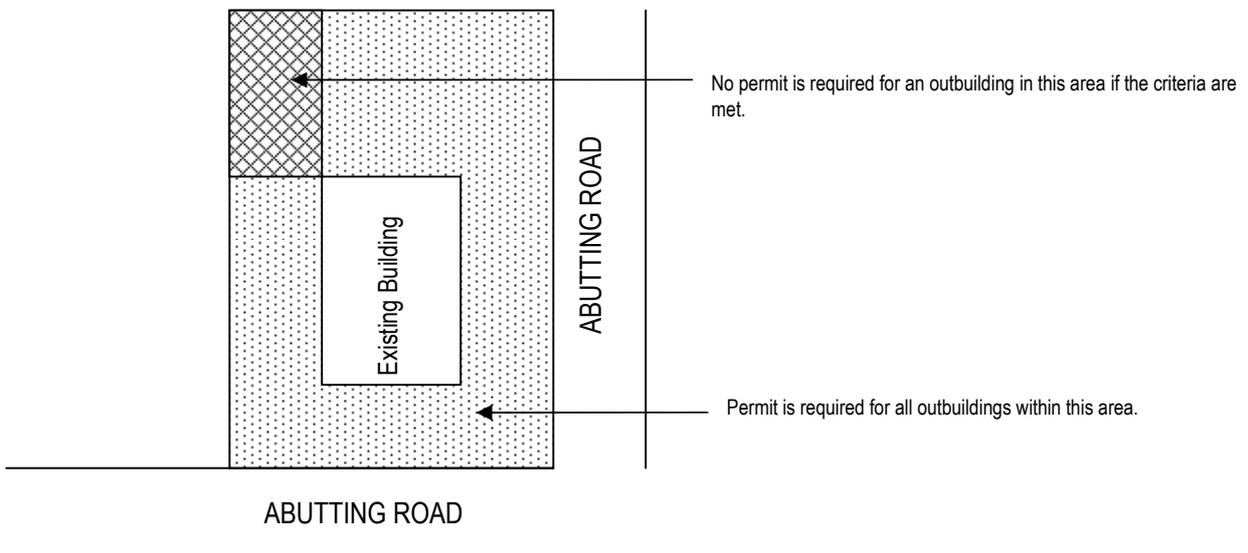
Exemptions for new outbuildings (carports/garages/sheds) for contributory places on a corner site within the Heritage Overlay.
